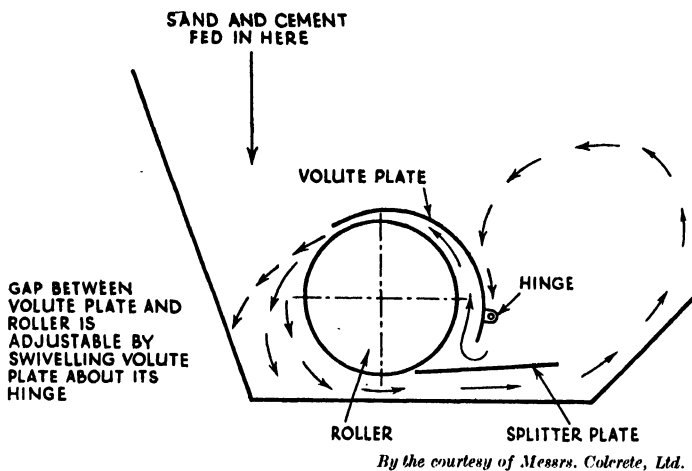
Flow Diagram for the Concrete Roller Type Grout Mixer.
